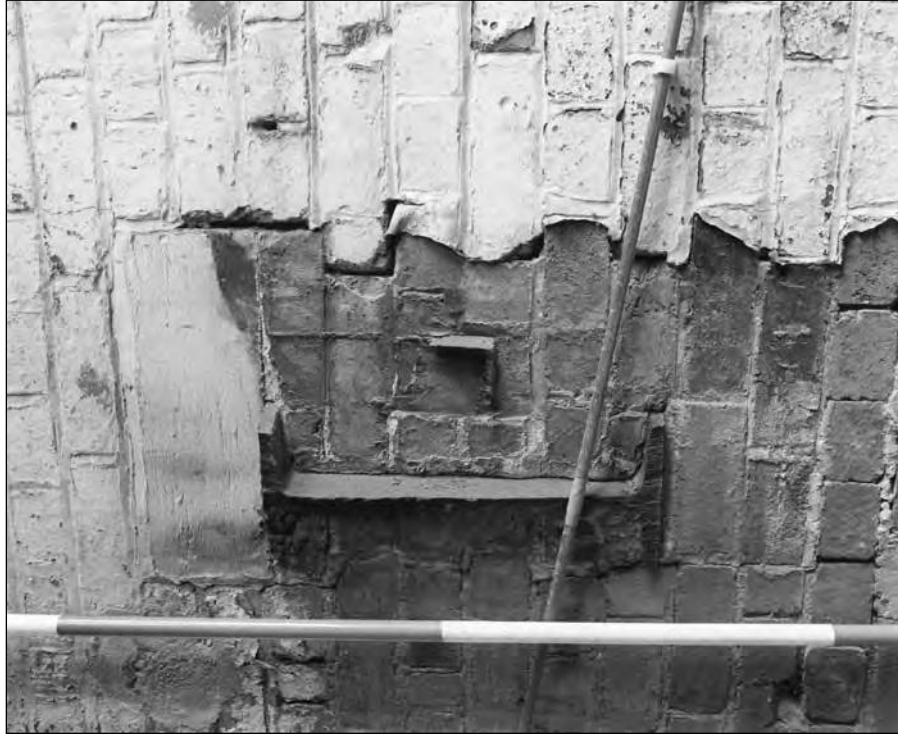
Building 4; rear elevation, truncated RSJ on wall by stairway (Film 6.5)
